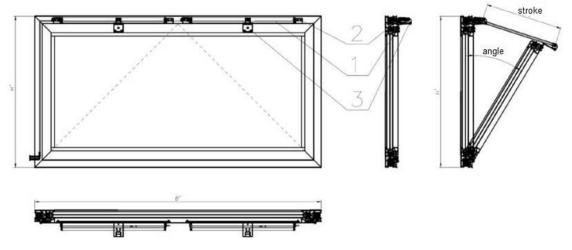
View and cross-sections of an example mcr OSO THERM smoke exhaust window opening to the inside, with a spindle actuator (shifted pivot point) and lock.
